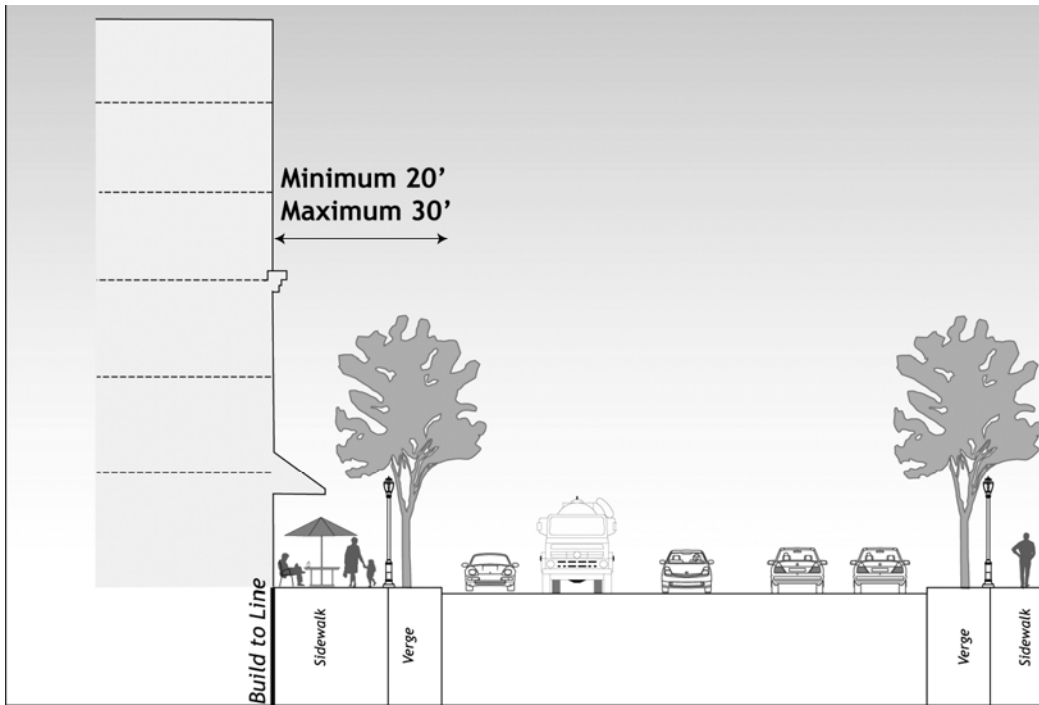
Build-to-Line for Facades Facing Streets Other Than City Avenue
